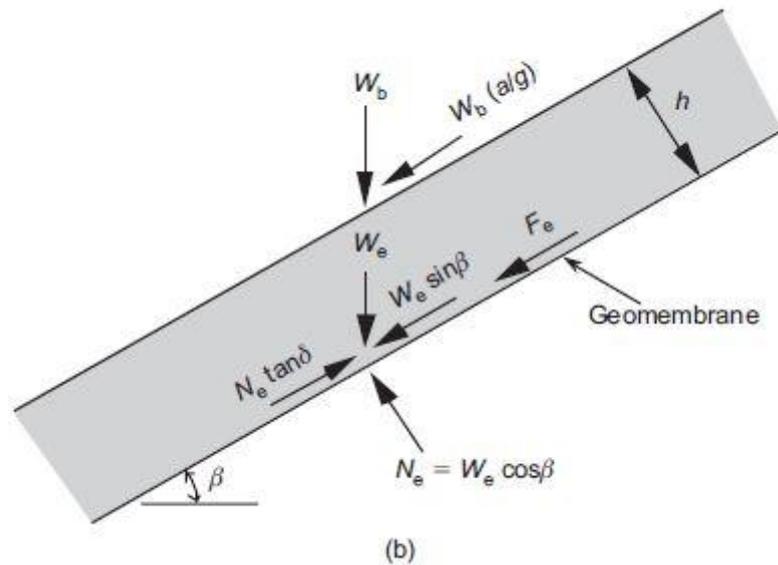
Balance of forces with equipment backfilling down slope (Koerner and Soong, 2005)
